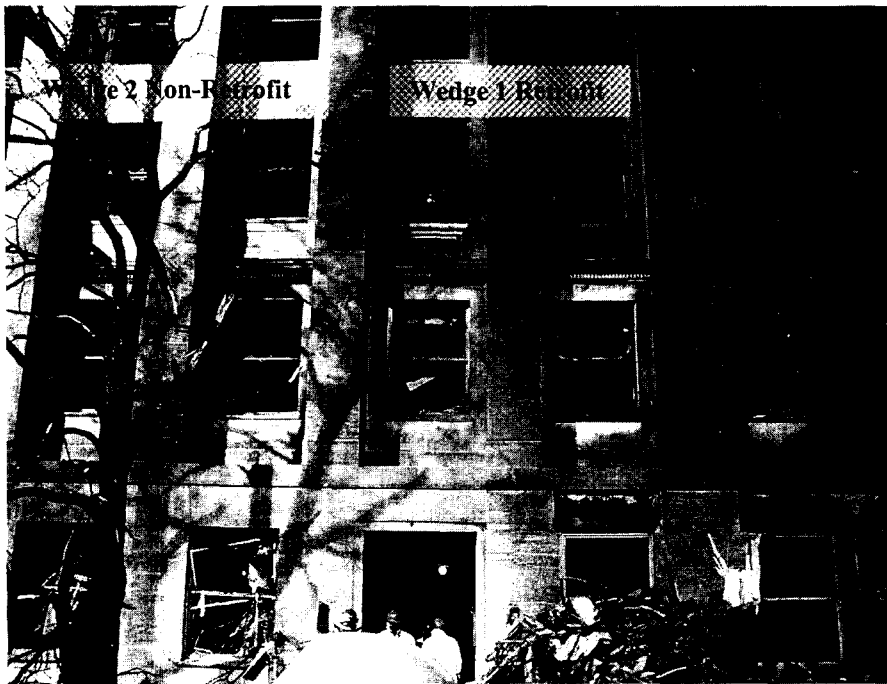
Exterior view of transition between Wedge 1 (on right, retrofit) and Wedge 2 (on left, non-retrofit). First floor non-retrofit window adjacent to transition may be High Hazard blast response. Second and 3rd floor fire damage. Approximately 135 ft (44.2 m) North of plane impact point.
